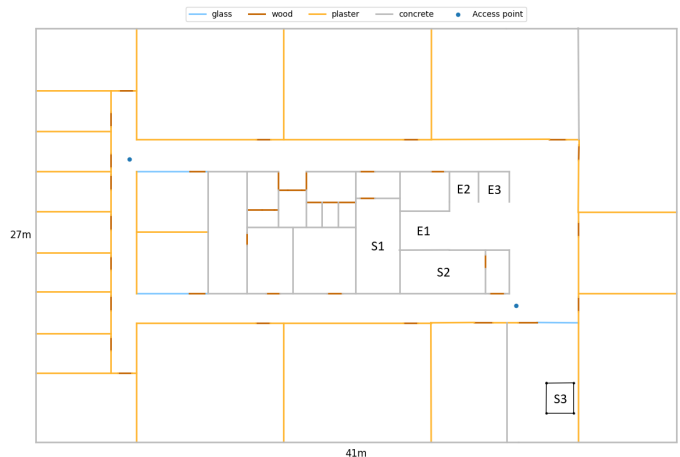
Floorplan of the fifth floor of the office building. E1-3 are elevators and S1-2 are closed concrete staircases which connect all other floors. S3 is an open metal staircase which connects to the sixth floor. The two blue dots in the corridors are access points. The other floors are almost identical.
